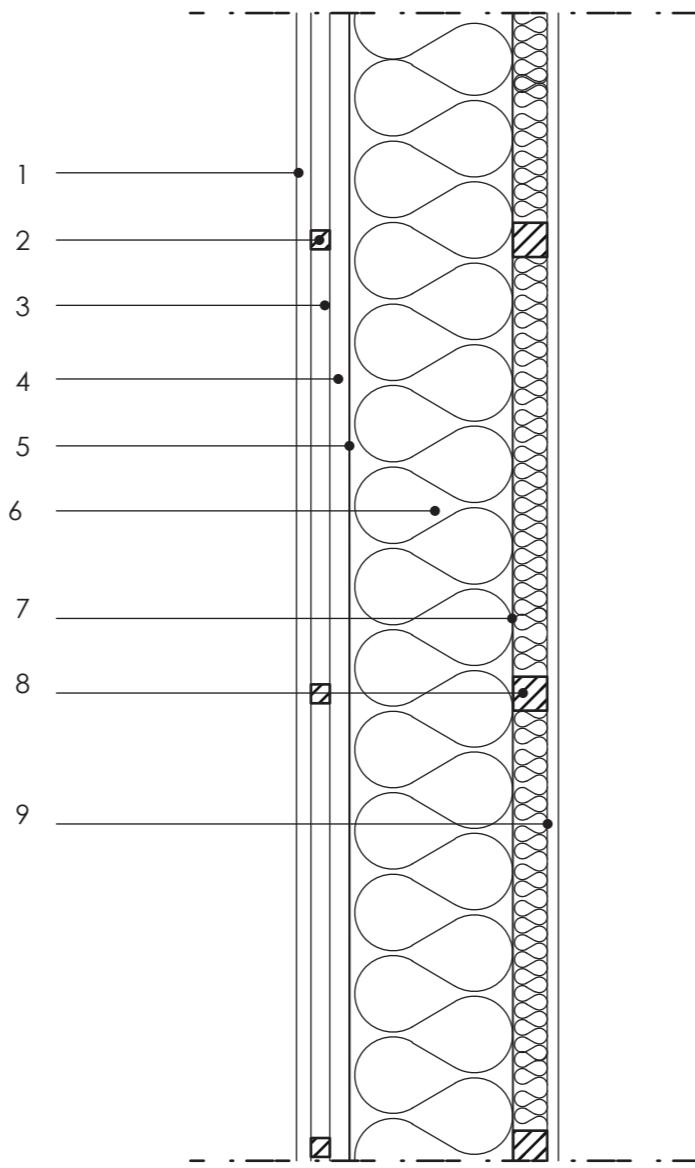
External Walls detail, scale 1:10 [AutoCAD]
